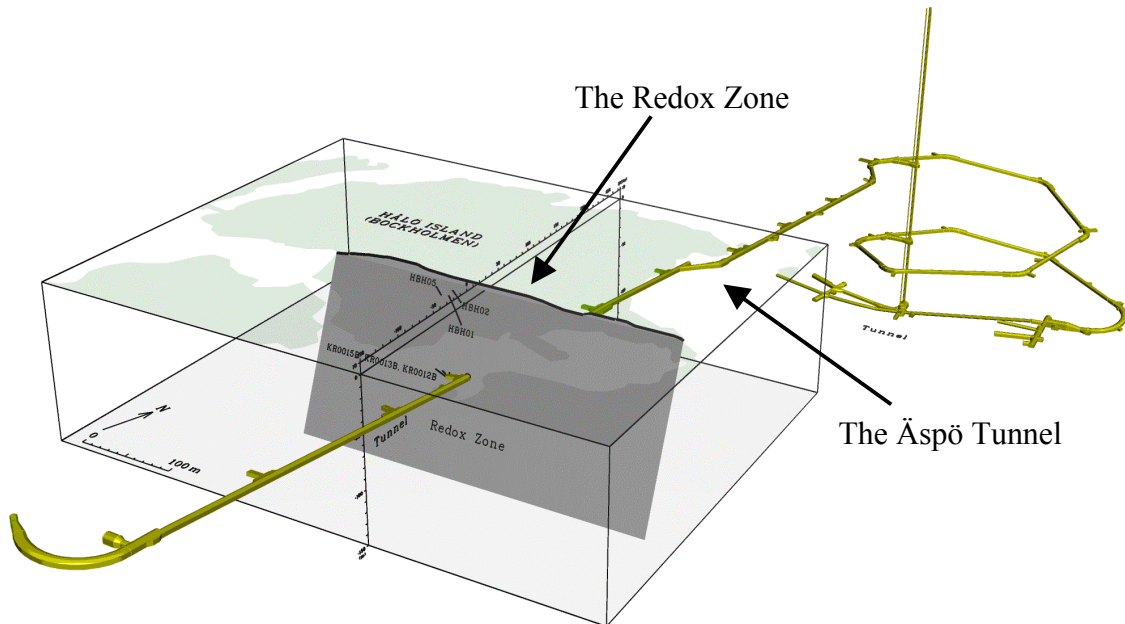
General layout of the Äspö HRL. The total length of the tunnel is 3,600 m. The spiral part of the underground excavation is connected to the Äspö Research Village by a hoist shaft. The first fracture zone intersected by the Äspö tunnel is known as the 'Redox Zone'.
